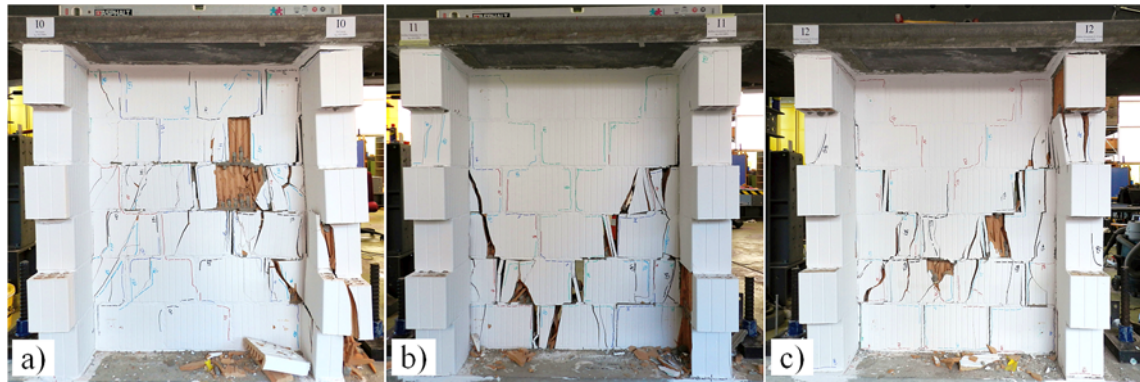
Crack patterns observed on the I-shaped wallettes of the first test series: a) Wallette I0; b) Wallette I1; c) Wallette I2 [57]
